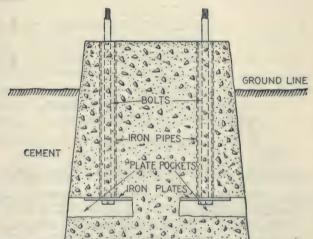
,734.—Concrete foundation showing method of installing the anchor bolts.
